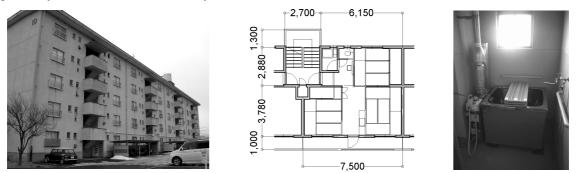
A Residential Building, a Dwelling Unit Plan, and a Bathroom Constructed in the Early 1970s
